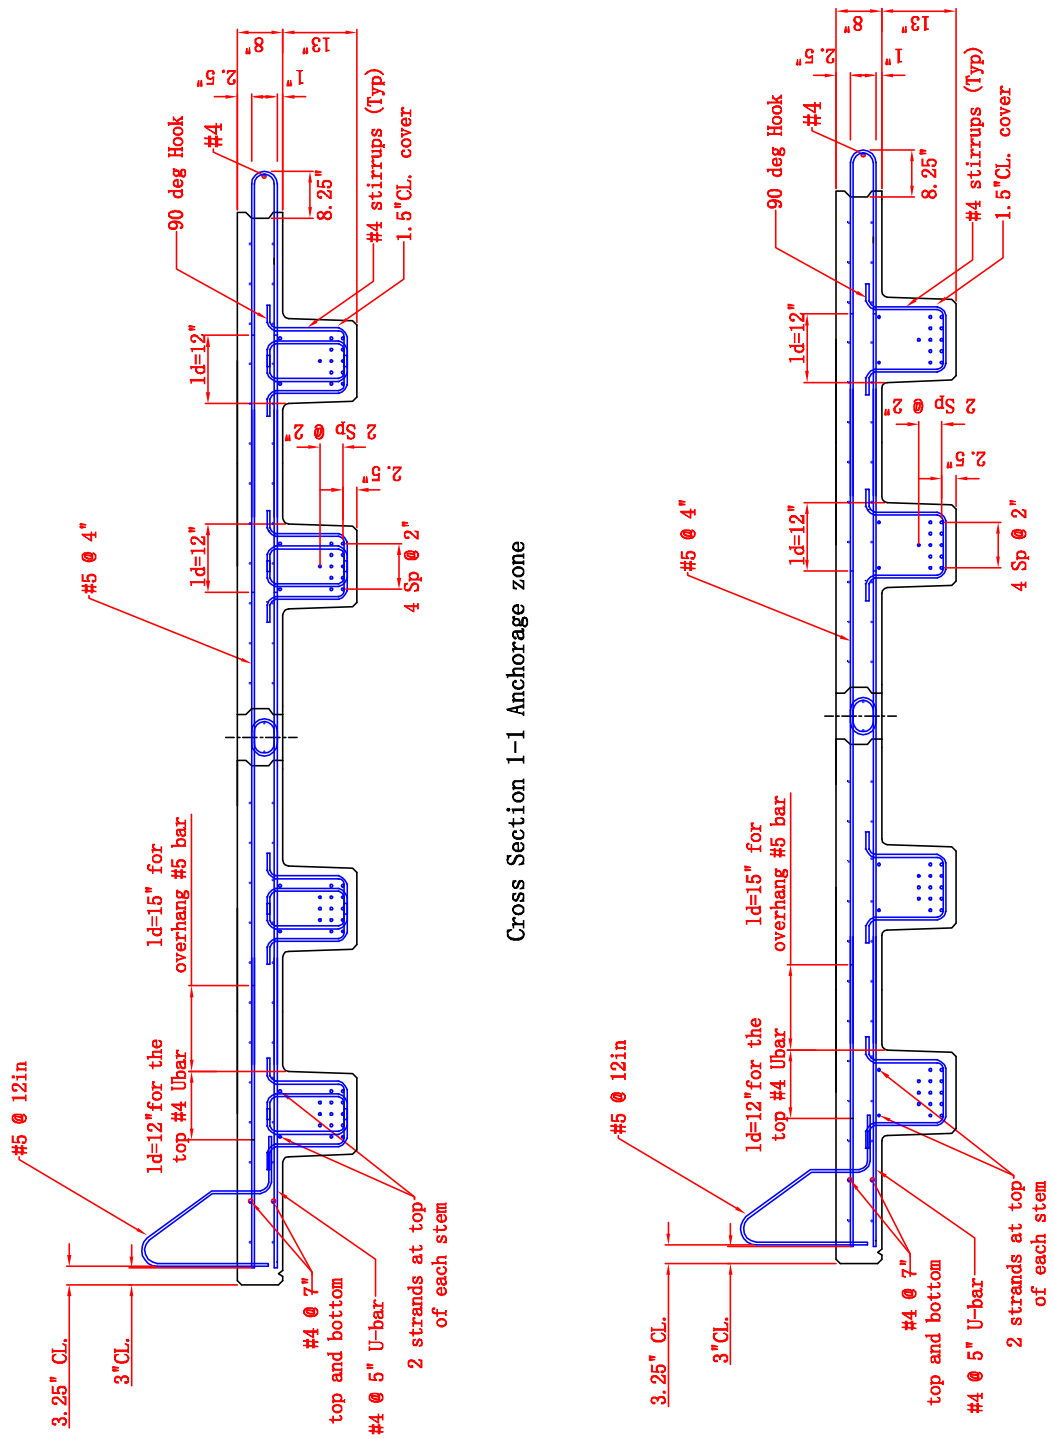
NEXT-8 40 ft. deck and beam cross-section detail
